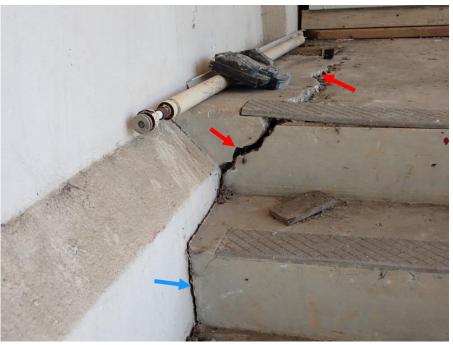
Crack in concrete landing at top of stairs on north facade (red arrow). Joint between north wall and stair treads indicated with blue arrow.
